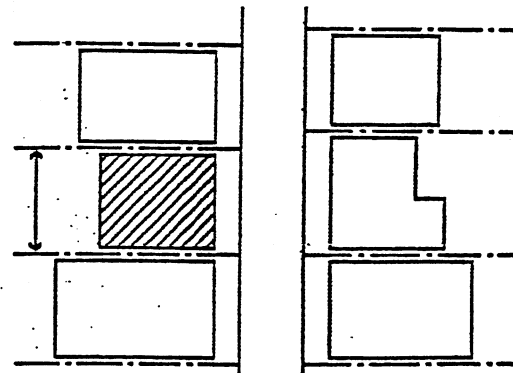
Maximizing the building's frontage helps to maintain a consistent street wall.
